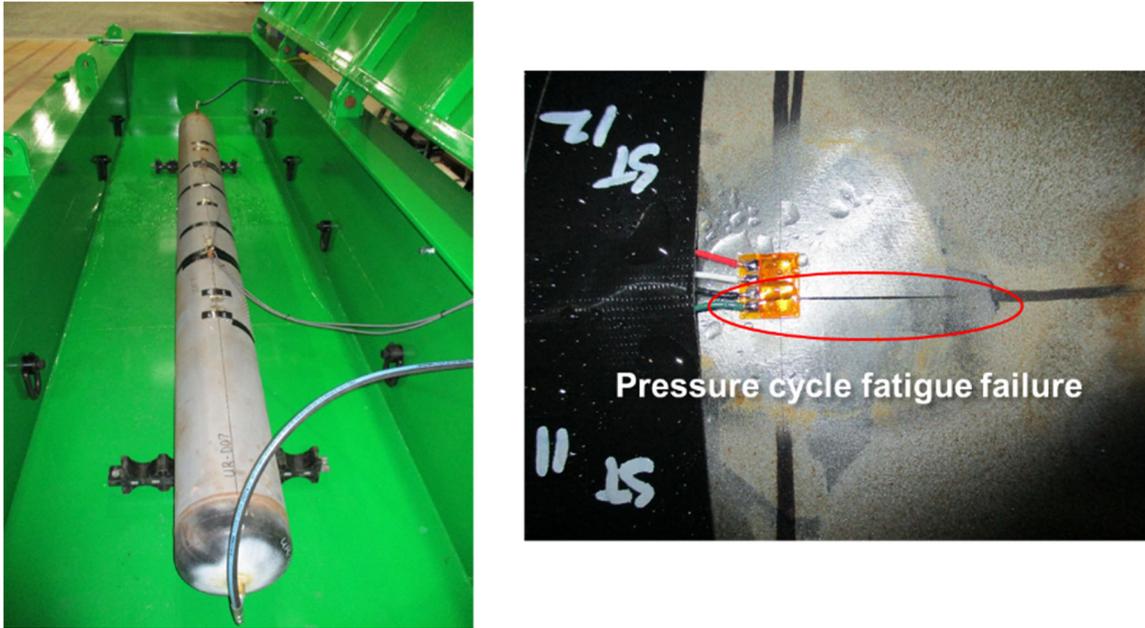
Photographs the dent test sample and associated fatigue crack
